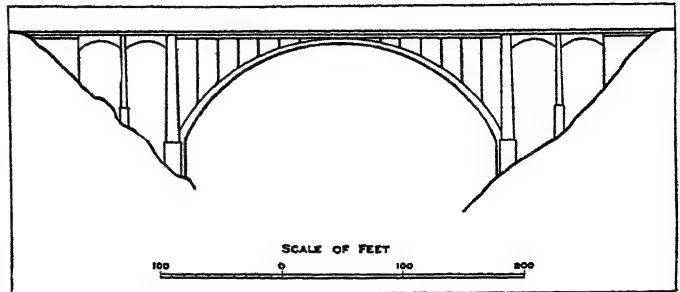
REINFORCED CONCRETE BRIDGE, STEIN TEUFEN, SWITZERLAND
